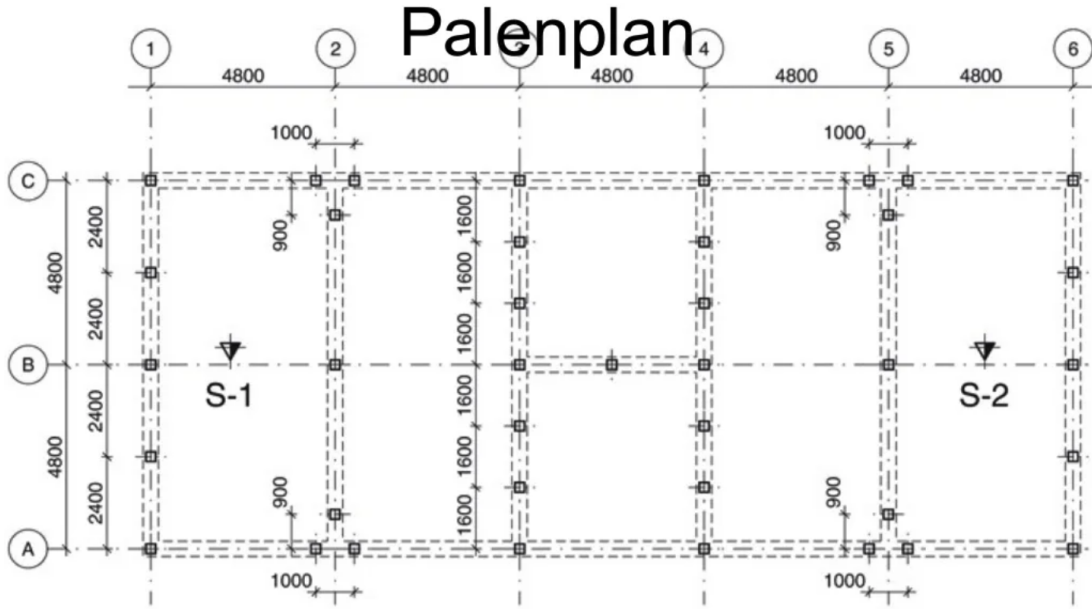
Example of a pile plan (i.e., 'palenplan' in Dutch).
